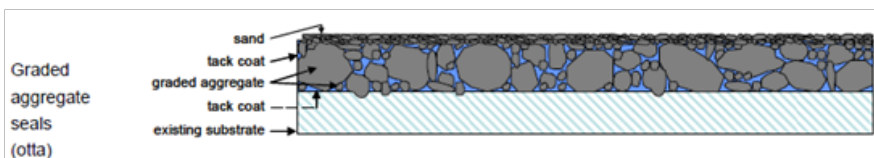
Graded (Otta) type chip sealed road pavement cross-section (SANRAL 2007)
